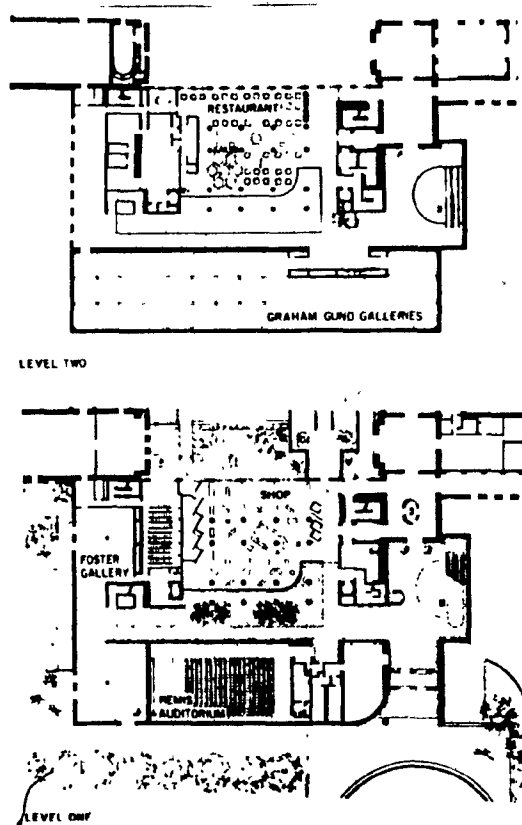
, Floor plans of the new addition. the Graham Gund Galleries are sky lit.
